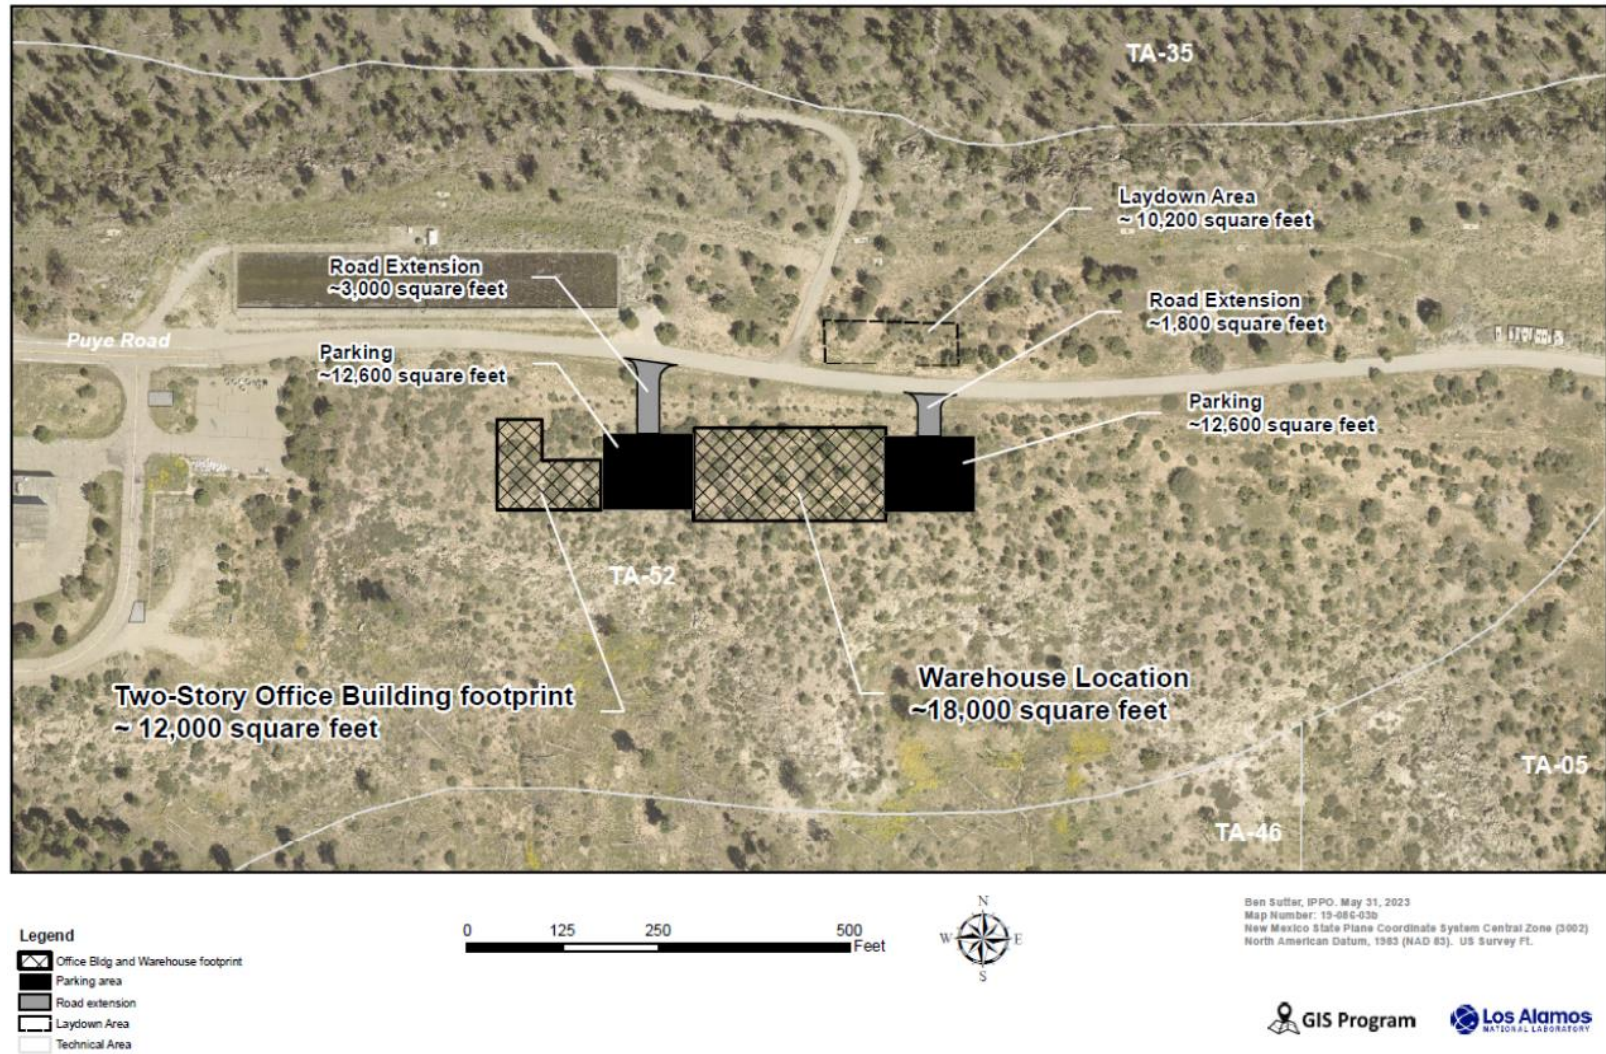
Potential Facility and Laydown Area Location at TA-52 for the Office Building and Warehouse (LANL 2023a | Figure 1-12 |)
